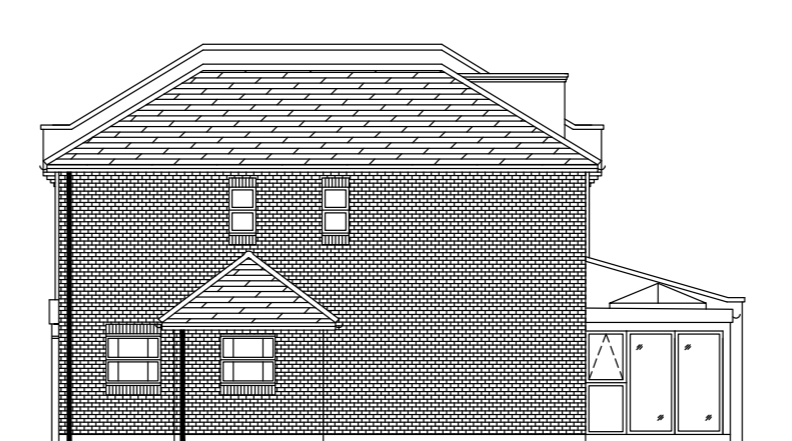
No. 6 Vantage Mews As Built Elevations
